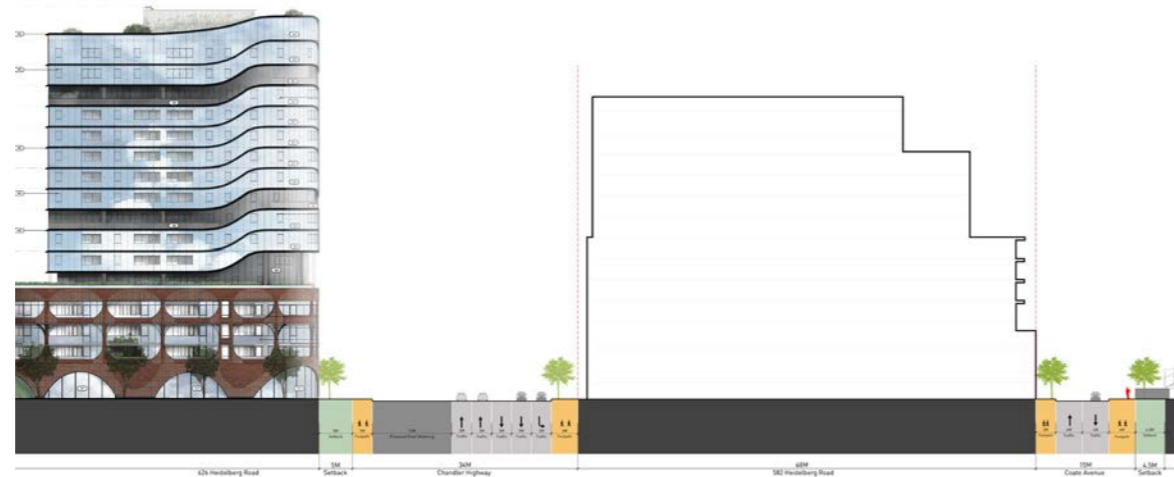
Building envelope of development proposal not supported at VCAT - An overall building height of 13 storeys that transitions to 11, 7 and then 3 storeys at Coate Avenue.
